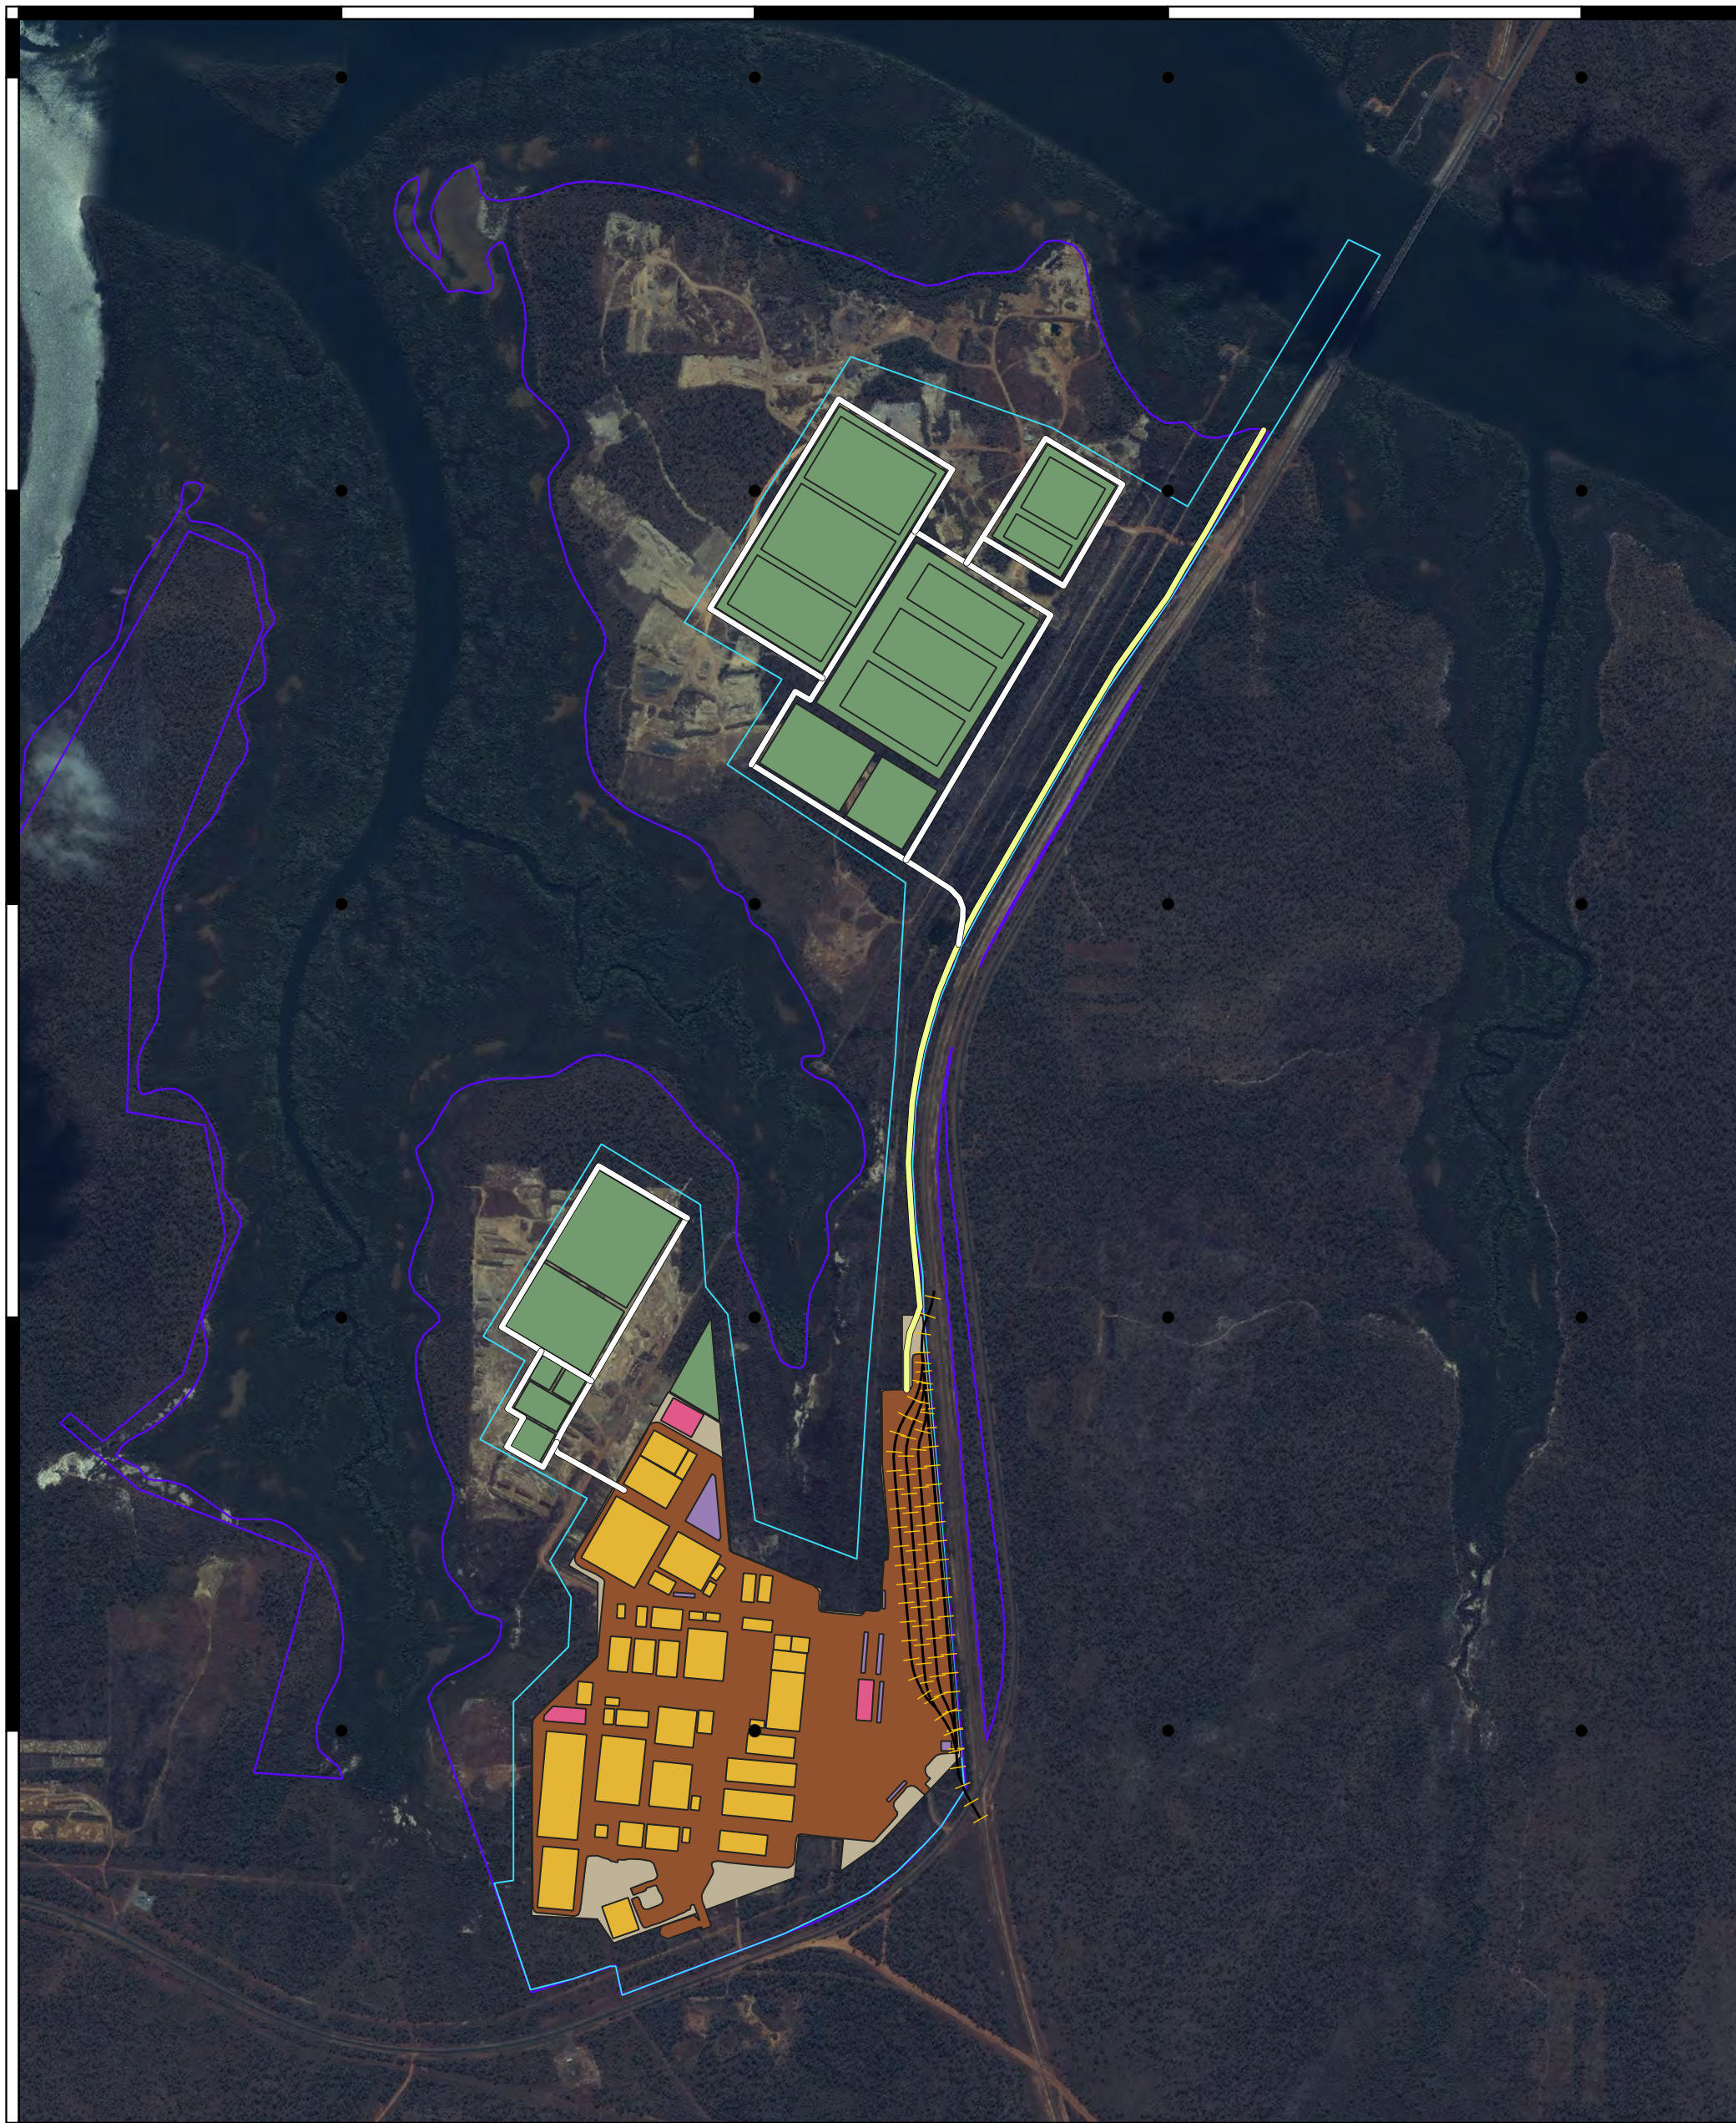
Lot 1817 and the Darwin Processing Facility Site Layout
